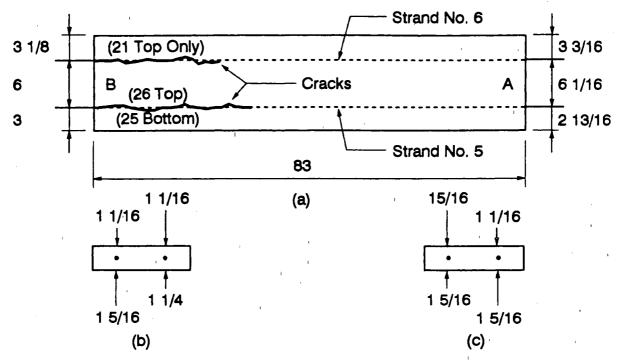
Specimen No. 2-2.5TC-3 (dimensions shown in inches):
